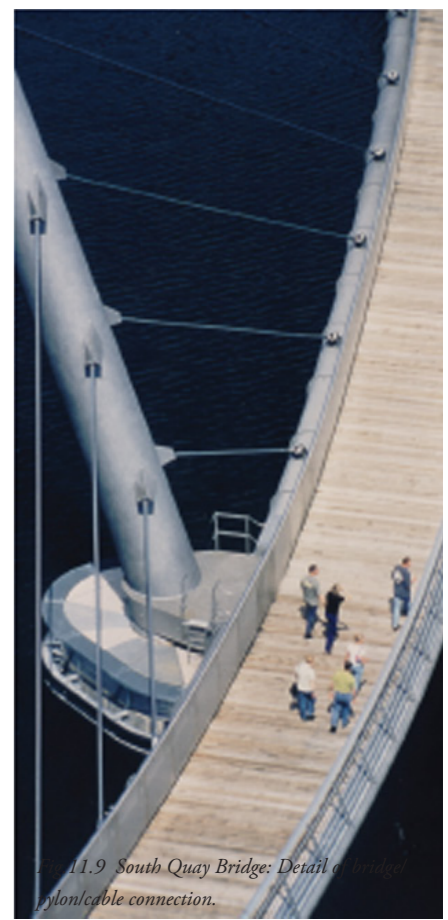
South Quay Bridge: Detail of pylon/cable connection.
